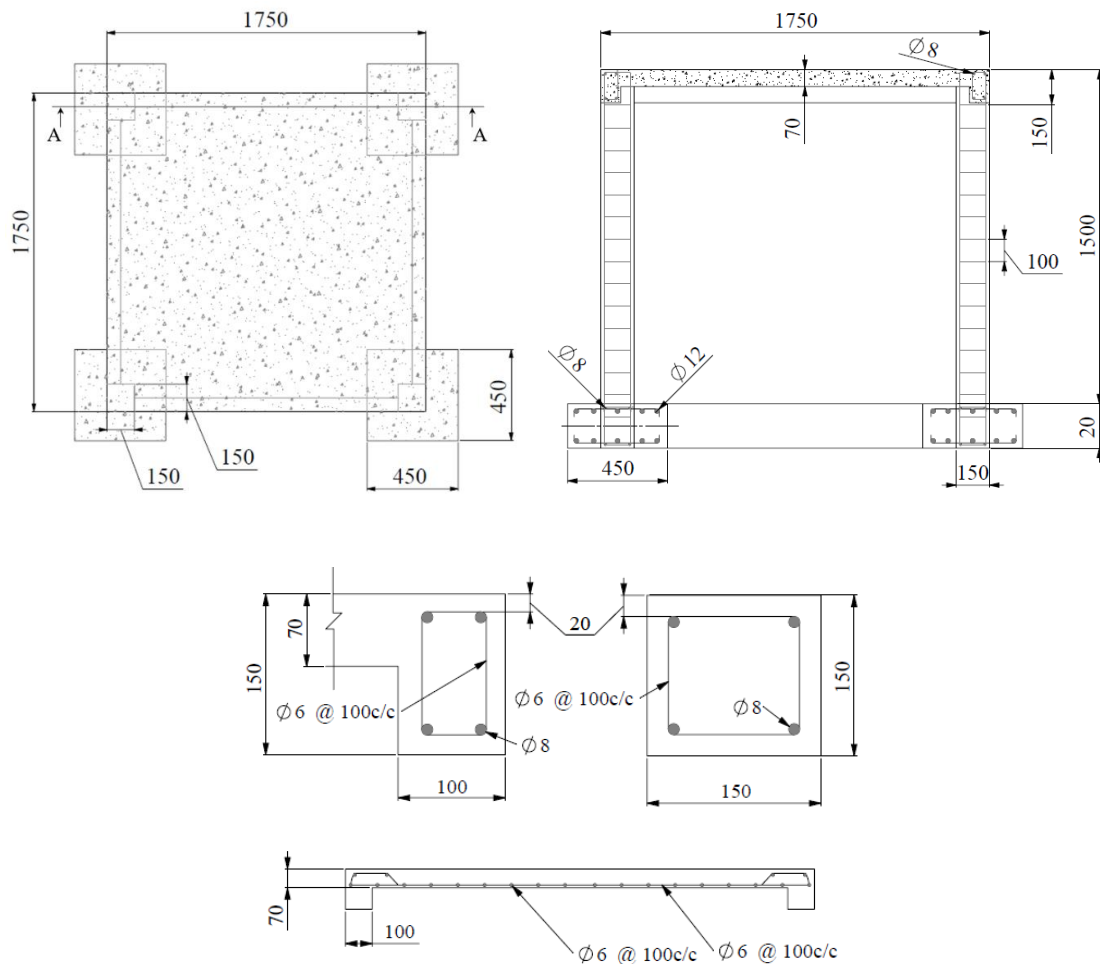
Geometry of the experimentally tested reinforced concrete (RC) frame (Parmar et al., 2014) (all in mm).
